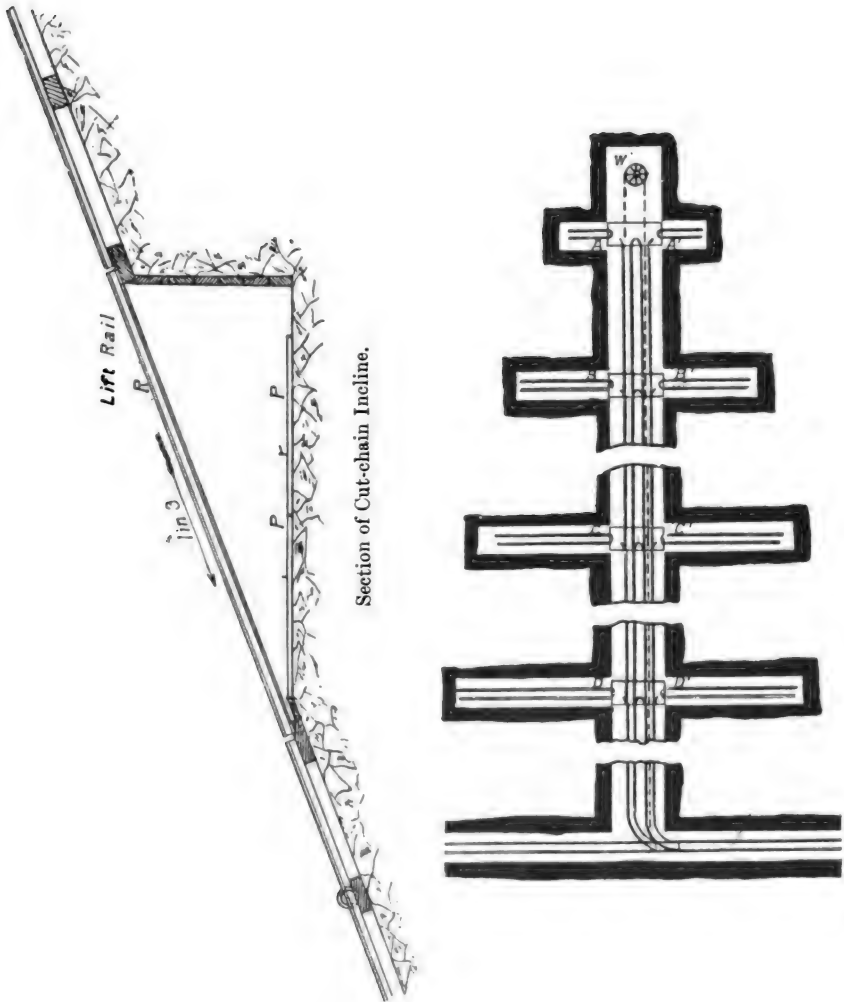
Enlarged plan of cut-chain, showing main and branch roads, with lift rails out of position.
